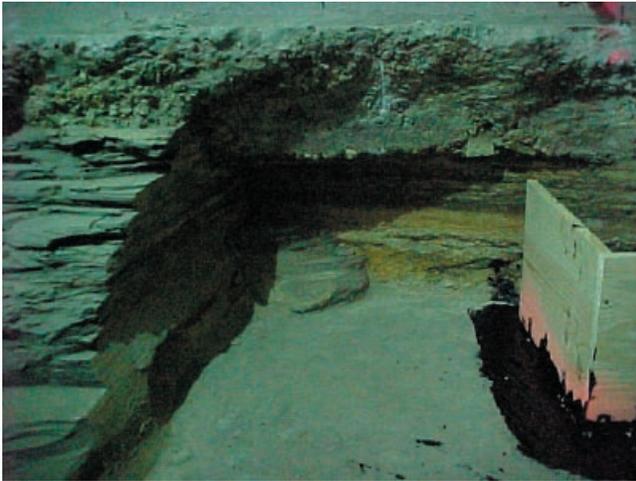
Cleats with copiapite in shale subcrop beneath the middle school, along with newly constructed concrete column forms.
